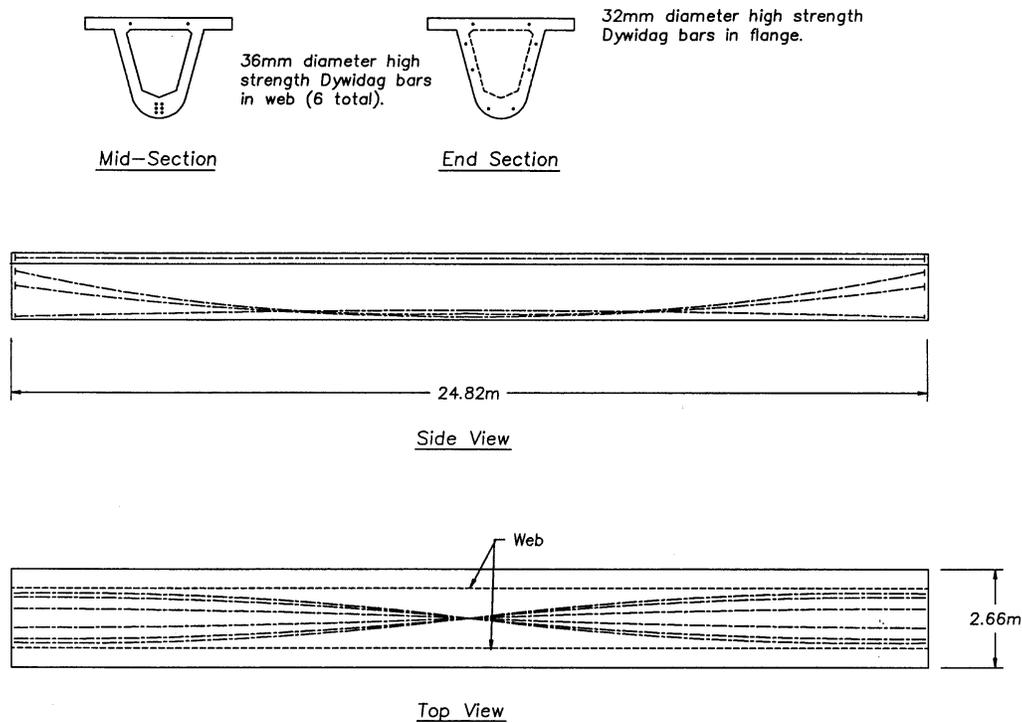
Post-tensioned steel arrangements in the TR07 girder.
